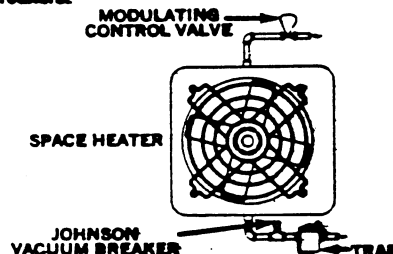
Typical space heater installation with Johnson Vacuum Breaker protection.
